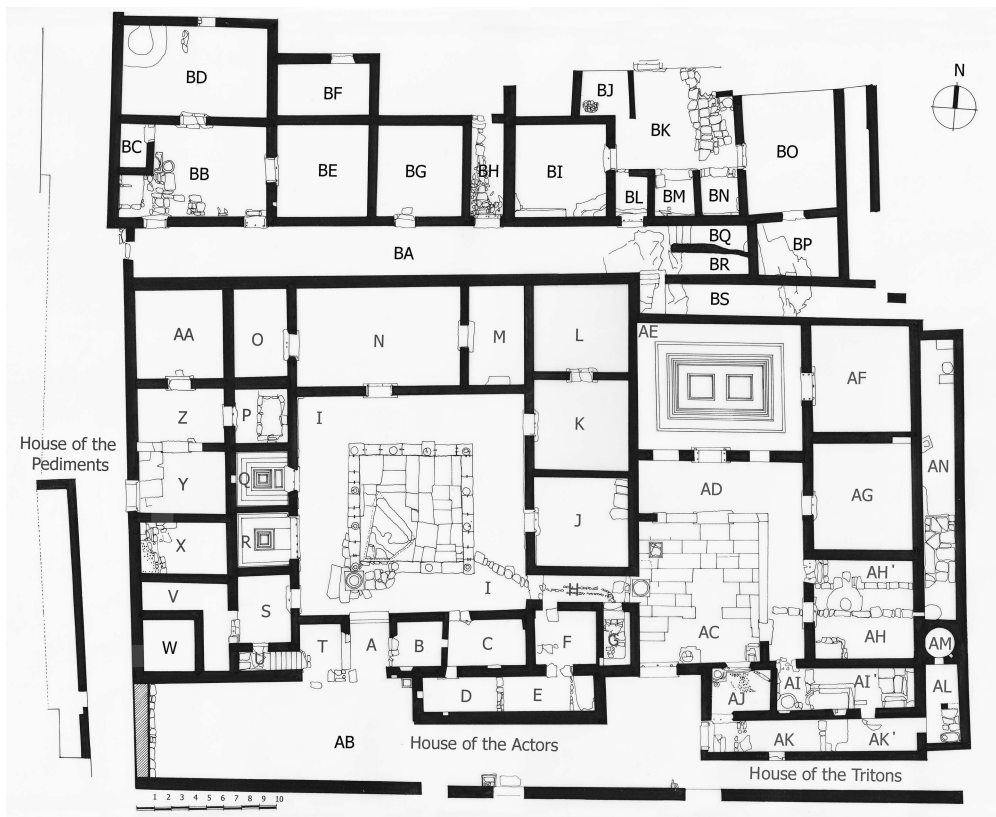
House of the Actors and House of the Tritons in the North District, plan
